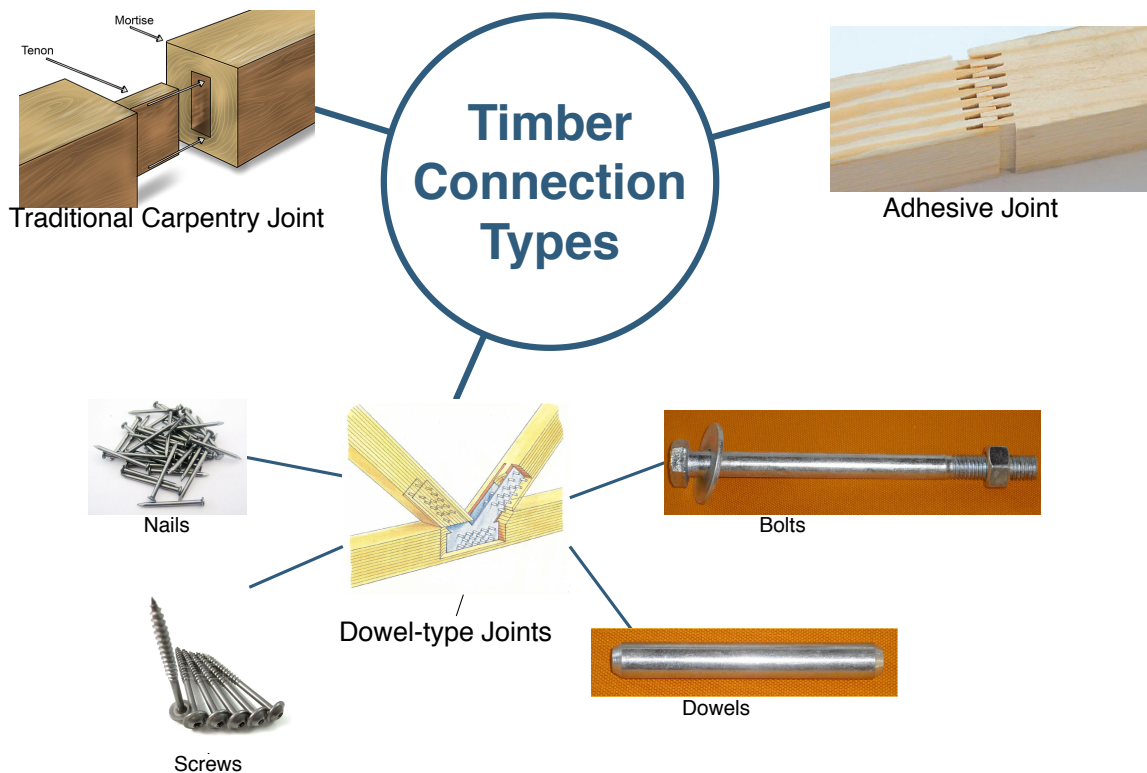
Illustration of timber connection types. Image sources (from left to right): traditional carpentry joints, nails, screws, steel dowels, bolts, structural finger joint
